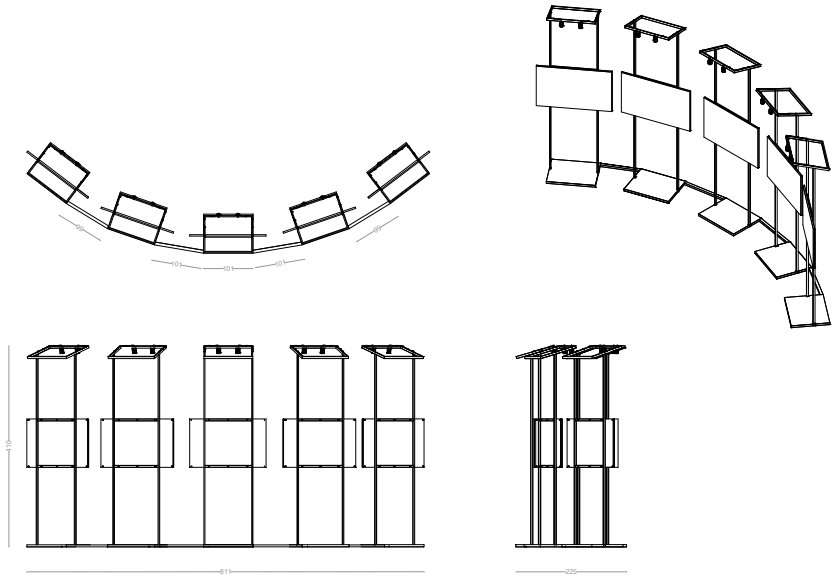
Construction detail - Configuration of display elements | Axonometric view, floor plan and elevations.
